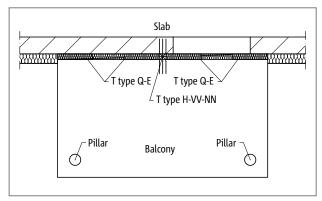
Schöck Isokorb® T type H: Balcony with pillar support
